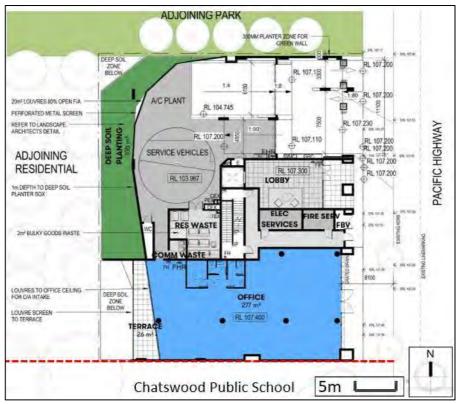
| Ground floor plan (Base source: Council's website, DA-2018/300)
